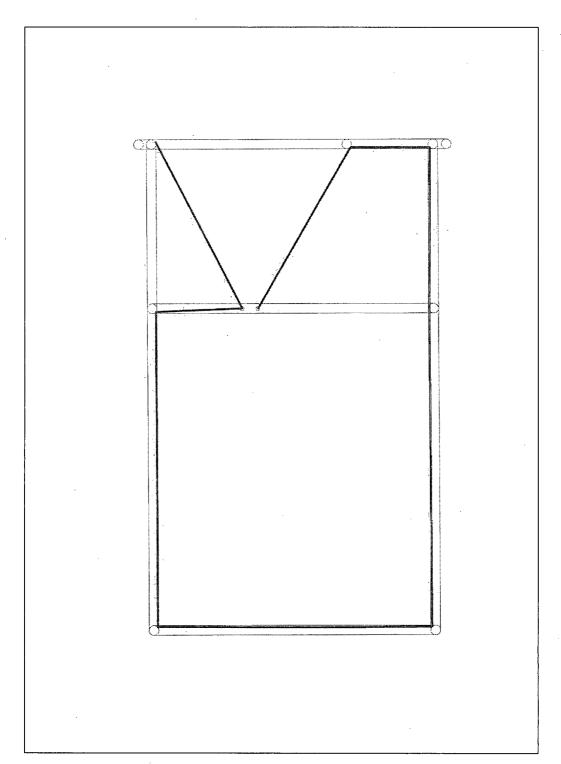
Plan view of Noxontown fish trap used to collect fish at the exit (upper end) of the fish ladder.
